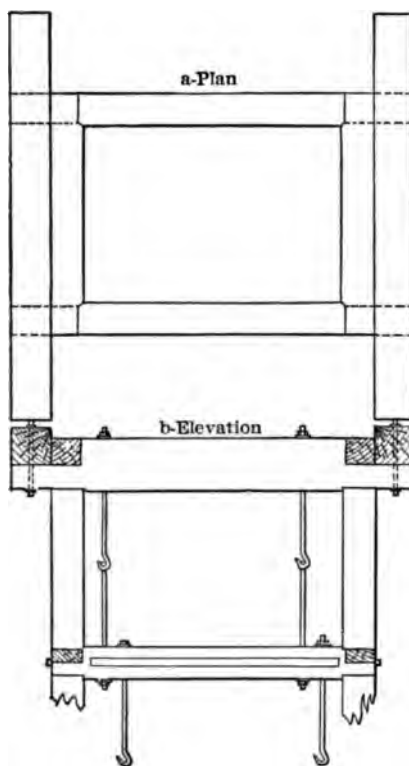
METHOD OF SUPPORTING SHAFT SETS.
